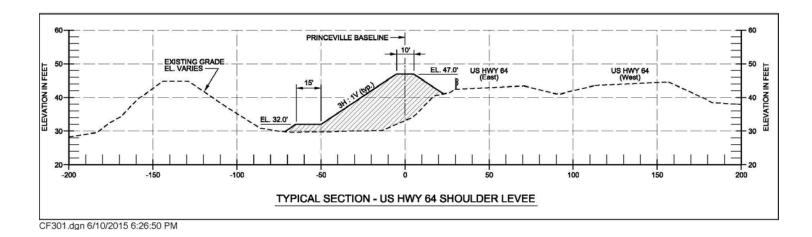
Typical Section Proposed Shoulder Levee – Segment 2
